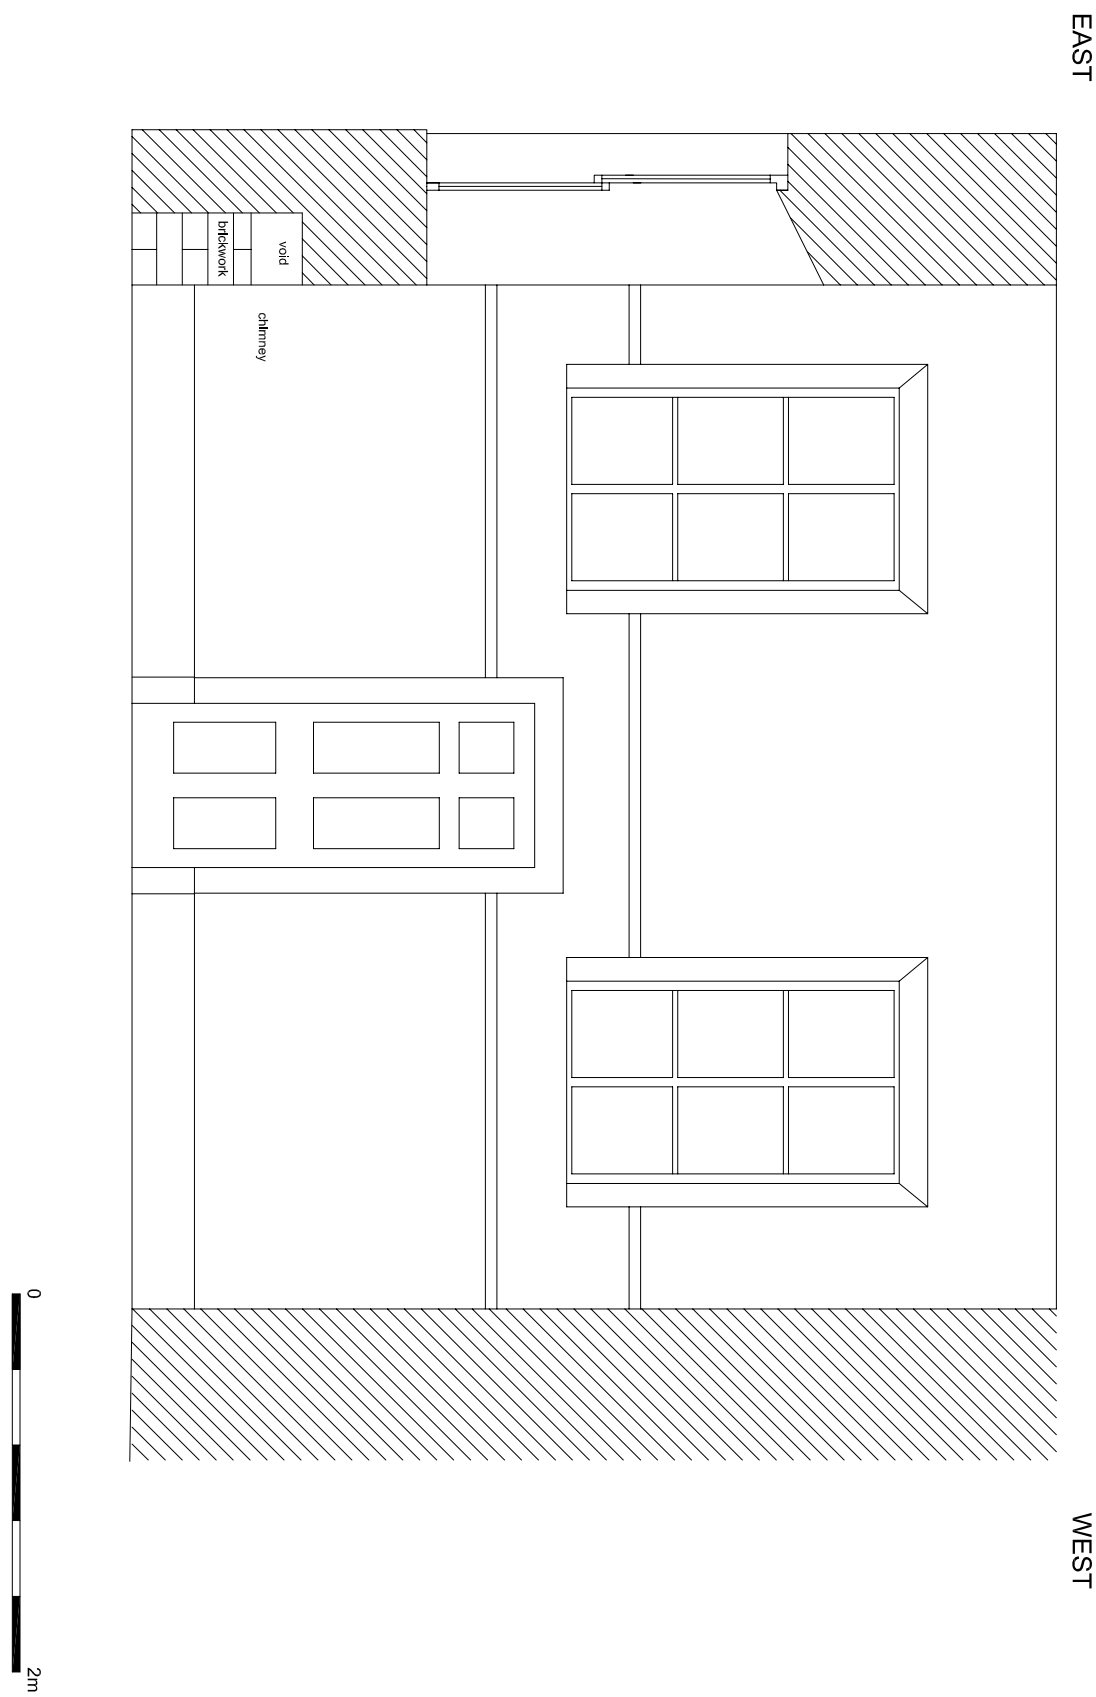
Task 27. North facing facade of platform-level rooms on platform 3, below staircase
